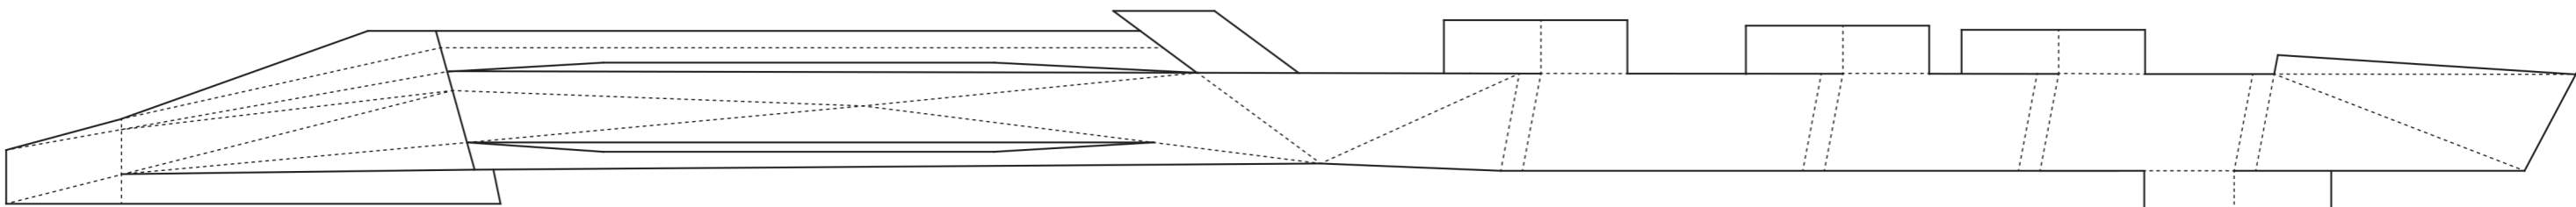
Basic illustration of the building made out of one piece of card, that can be folded into its three dimensional form.
